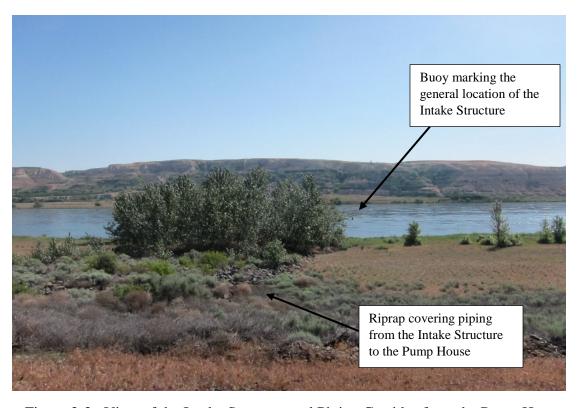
View of the Intake Structure and Piping Corridor from the Pump House
